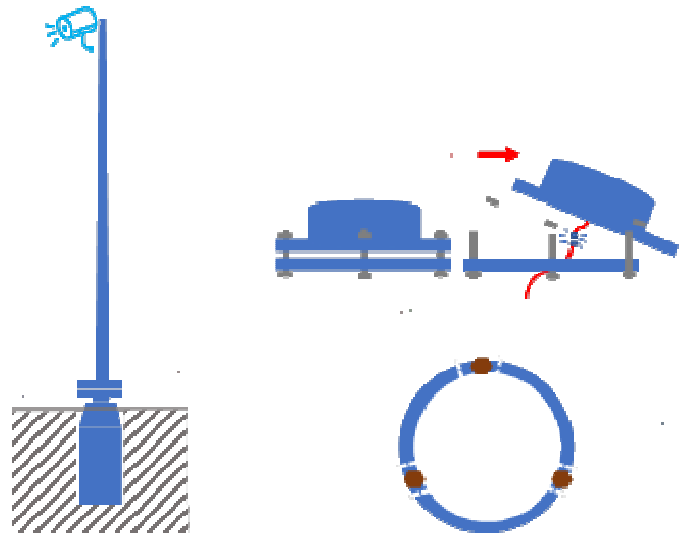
Mounting Pole Elevation and Detail of Slip Flange and Breakaway Washer (indicative only)
